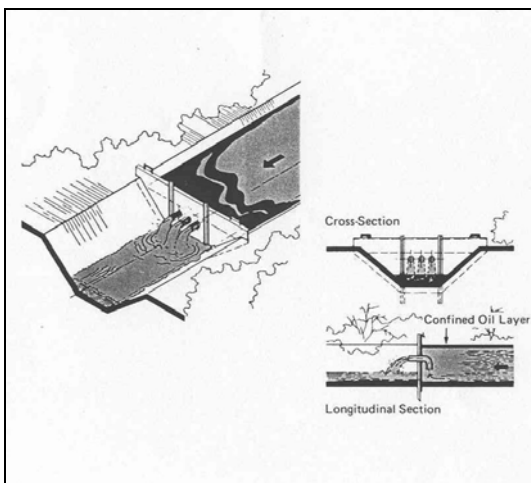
Wooden Underflow Dam Concawe, 10/83)
